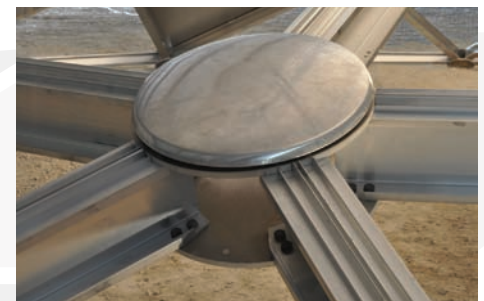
The attempt to form threads in the beam at the extrusion mill is not practical due to normal extrusion process tolerance. A screw will strip out the threads in the slot after one or two installations and will not develop maximum strength. No flange stiffeners are allowed due to manufacturing limitations. The gasket compression is the sole device for sealing the joint.
